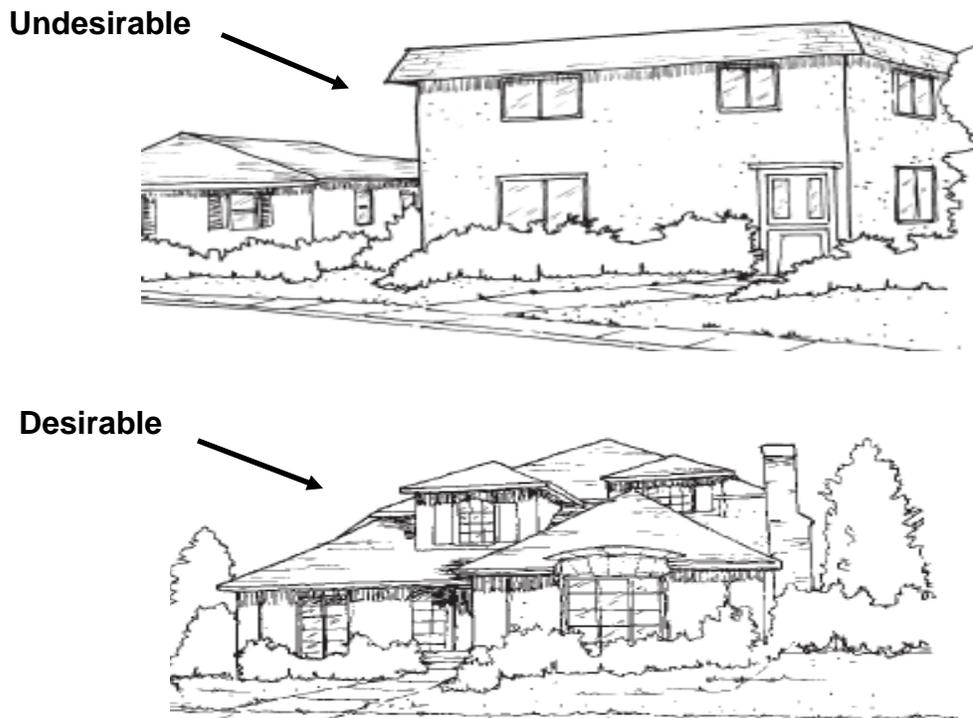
The original design with two-story building walls appears too massive, and is far too plain and rectangular. The hipped dormers and projecting room elements assist in reducing the bulk of the revised design.
